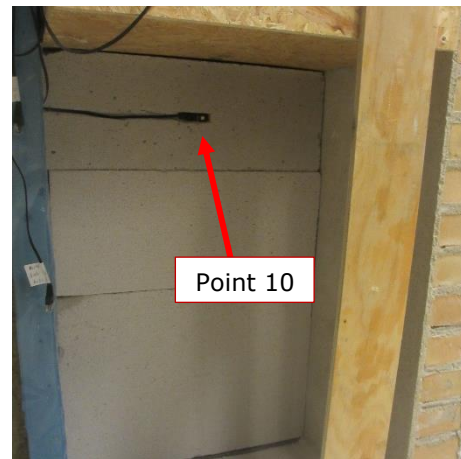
Sensor Point 10: Measurement point in deliberate thermal bridge in front of wall plate.
